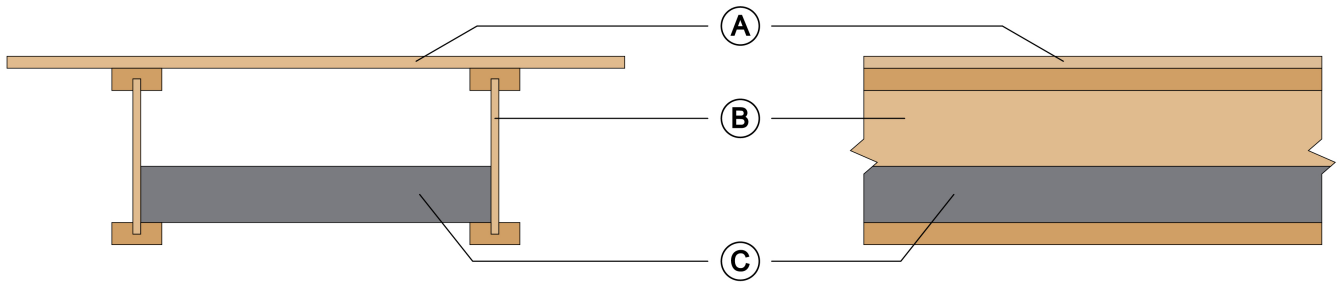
Fire protection of floors FP-04 - fire protection: mineral wool insulation
